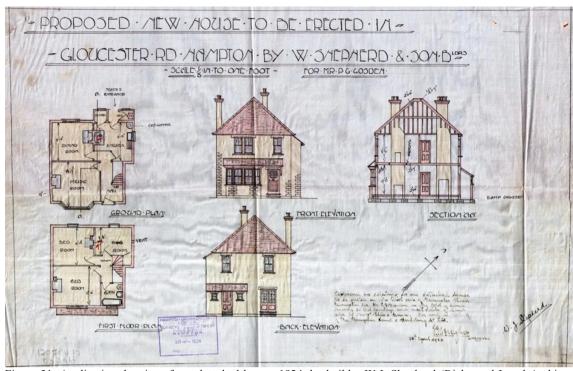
Application drawings for a detached house, 1924, by builder W.J. Shepherd (Richmond Local Archive, PLA/03281)
